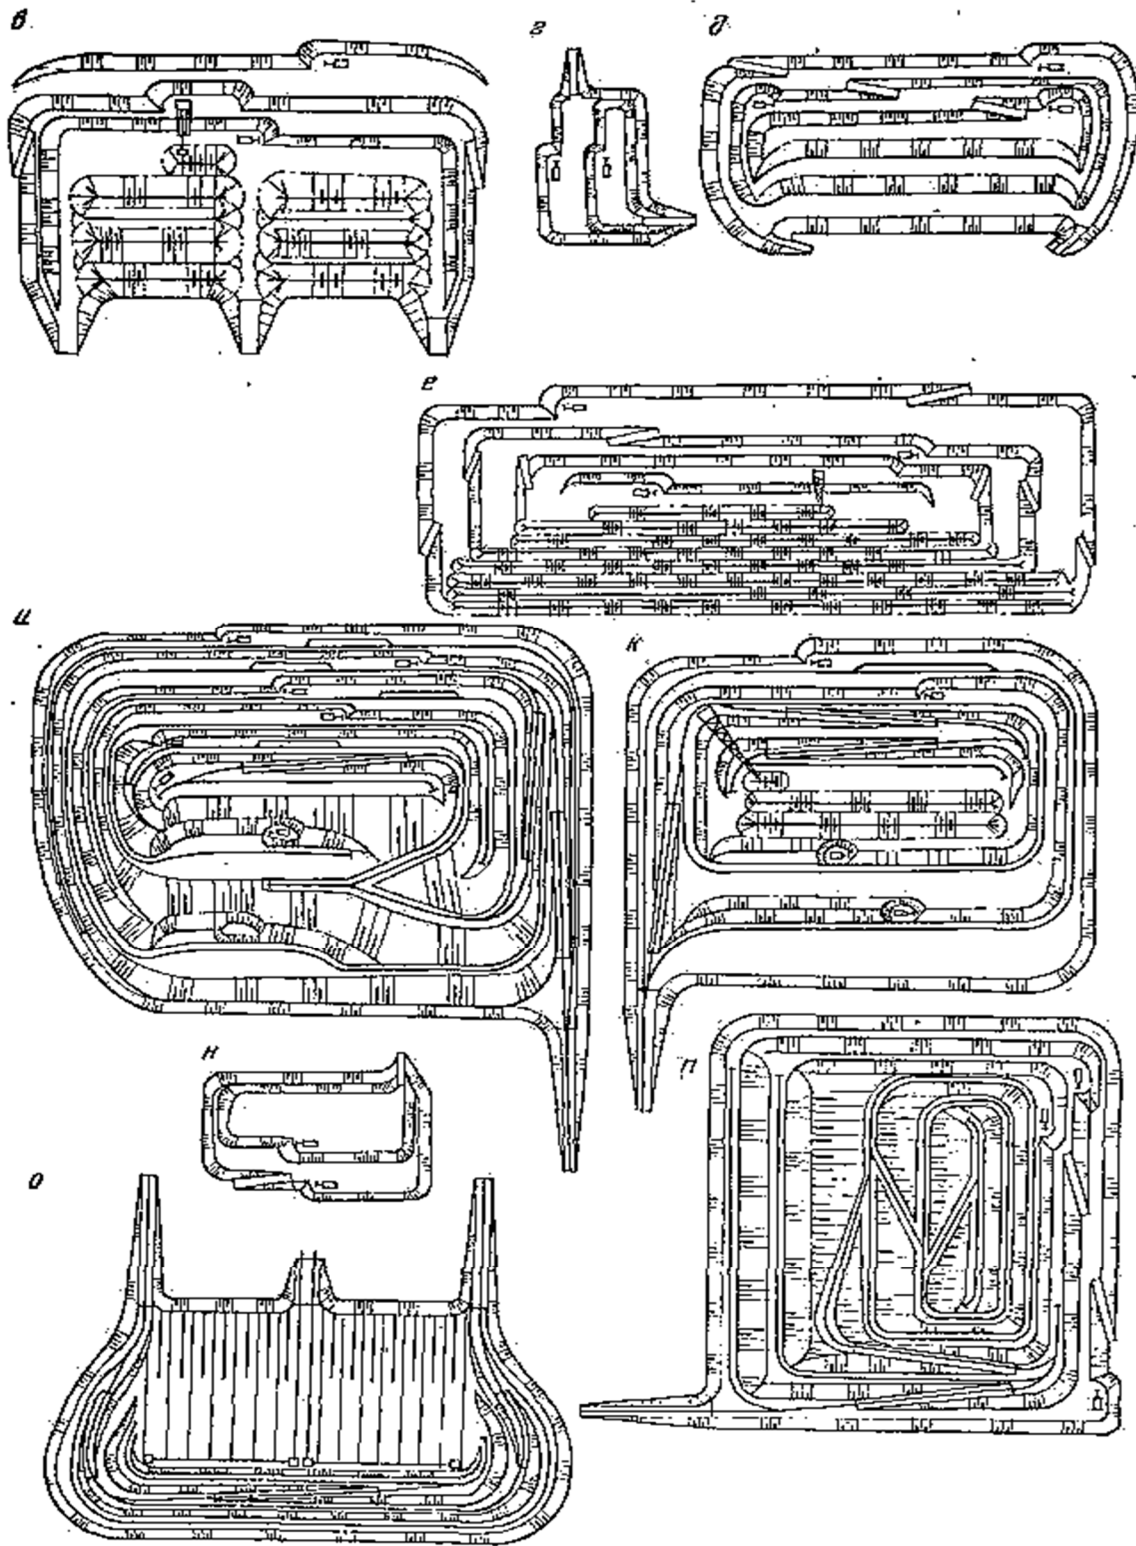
Methods of opening horizontal and shallow deposits.
